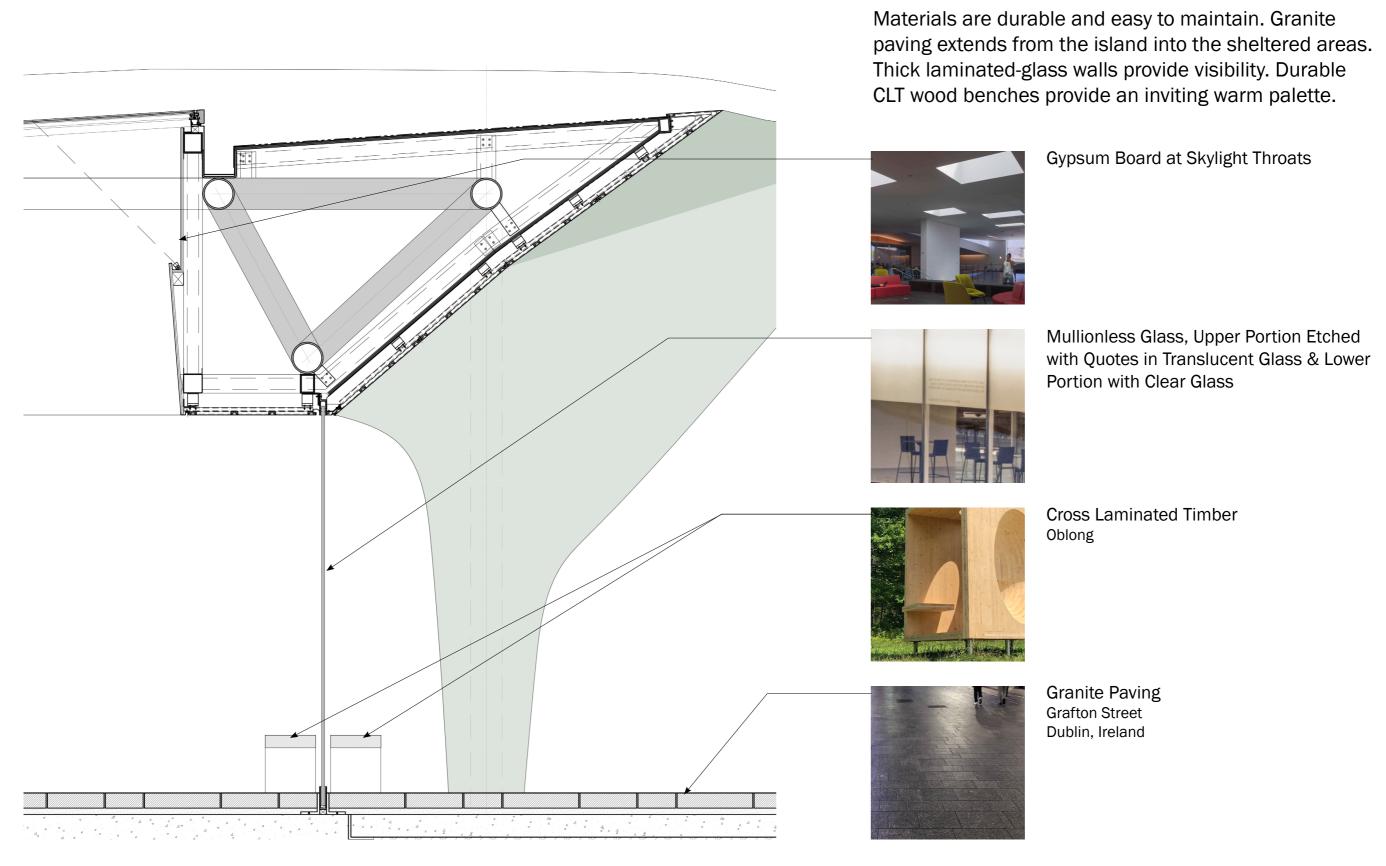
TYP. WALL SECTION, SCALE=1/30
